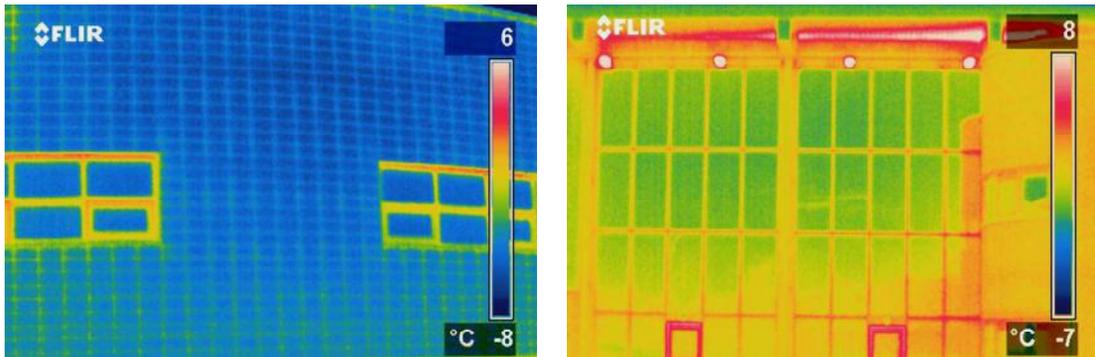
Building C thermography: reasonably continuous insulation across the external wall (left); thermal bridge at the junction between the curtain wall and the roof (right)
